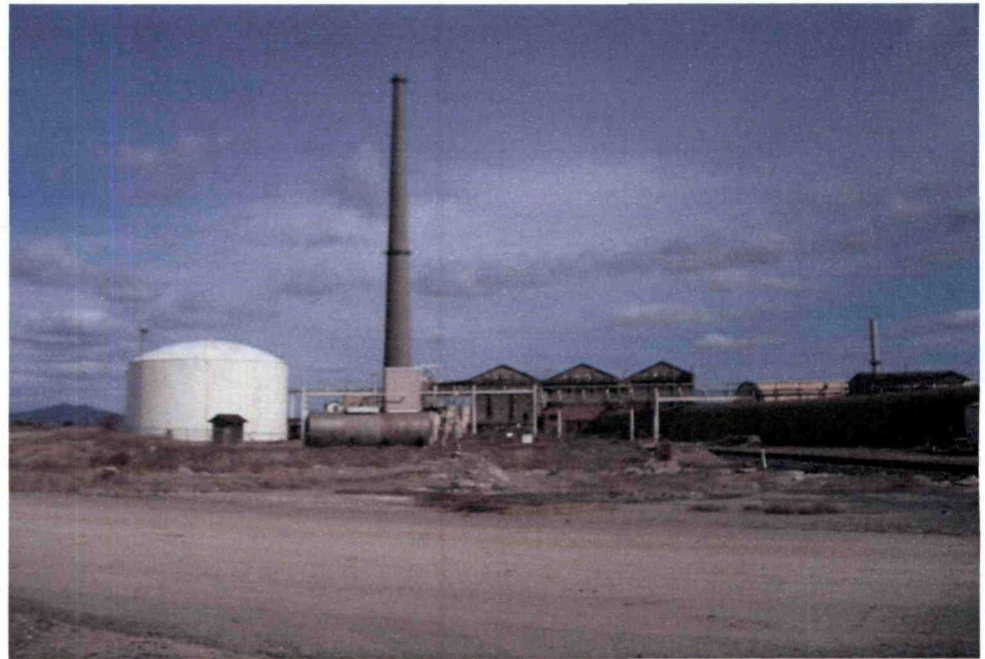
; Facility: Asarco East Helena Smelter; Subject: Temporary Cover on Former Acid Plant Sediment Drying Area;
